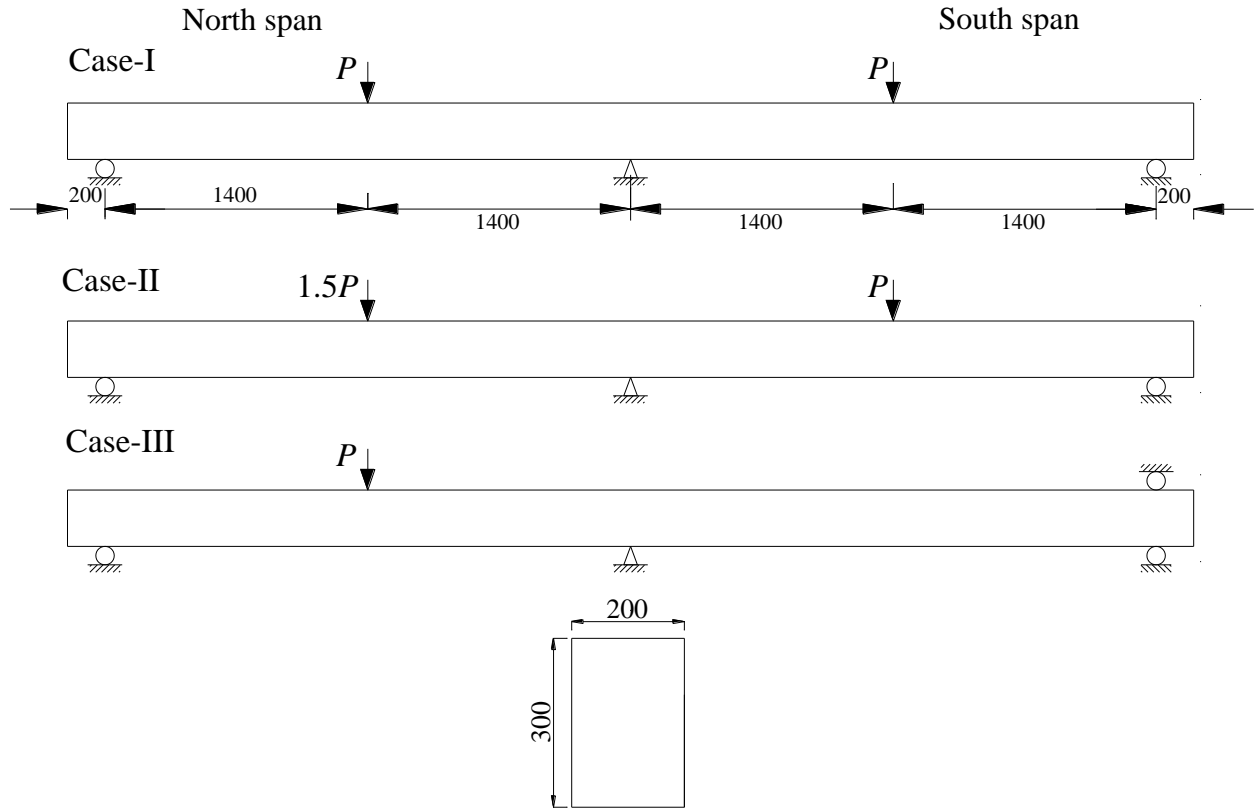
Loading conditions with longitudinal and sectional profile of the test beams of Series 2
